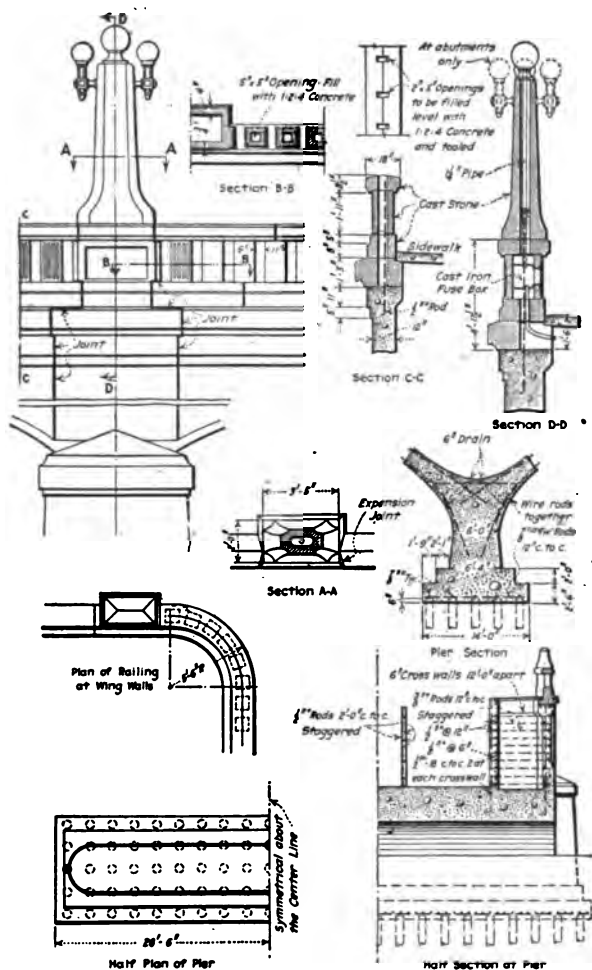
C.—Details of Olentangy River bridge on King Avenue, Columbus, Ohio.
